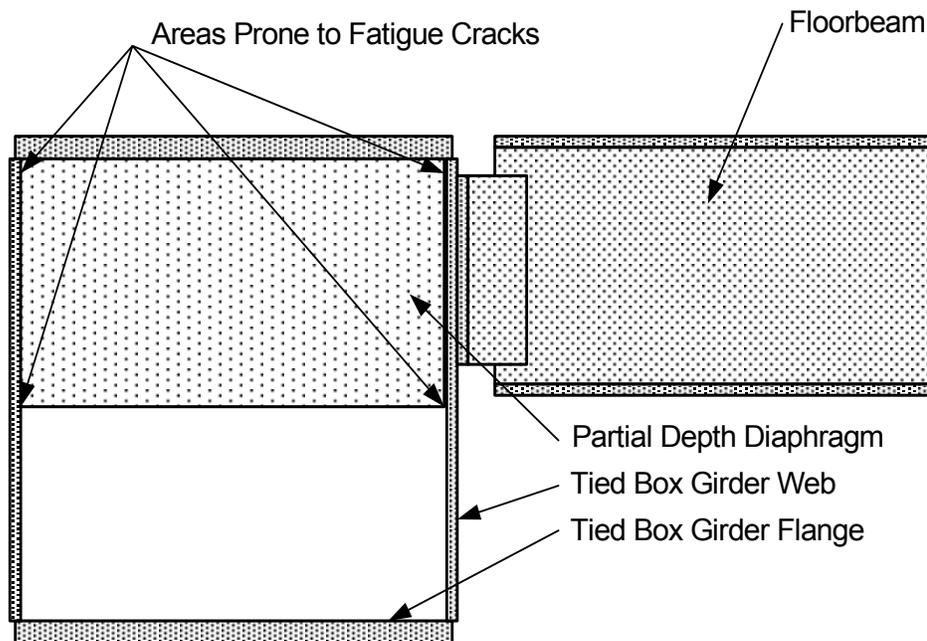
Partial Depth Diaphragm in a Tied Box Girder
